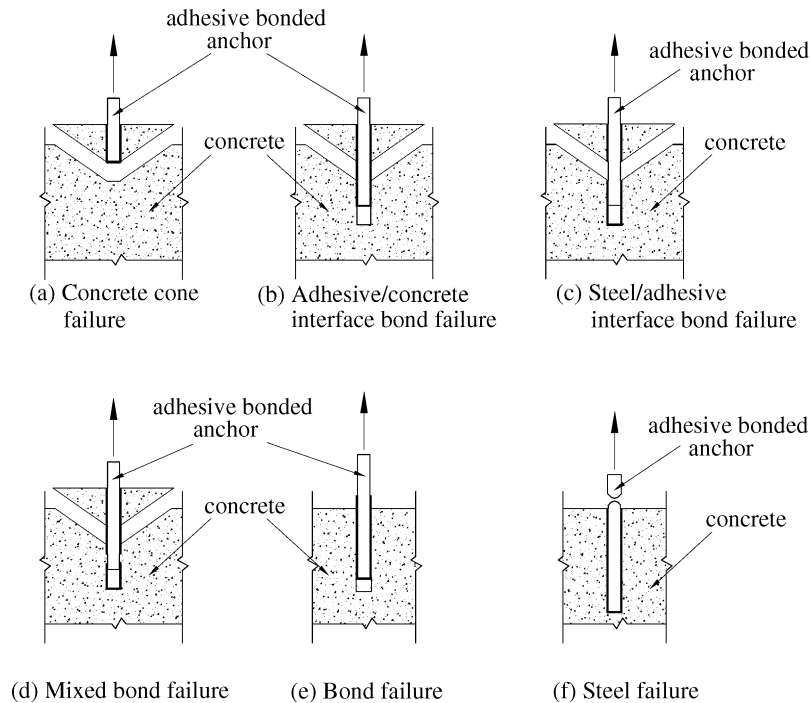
Failure modes observed for adhesive anchors: (a) concrete cone failure; (b) adhesive/concrete interface bond failure; (c) steel adhesive interface bond failure; (d) mixed bond failure; (e) bond failure; (f) steel failure.
